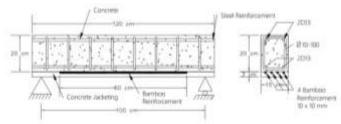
Detail of retrofit reinforced concrete beam specimen with four bamboo reinforcement
